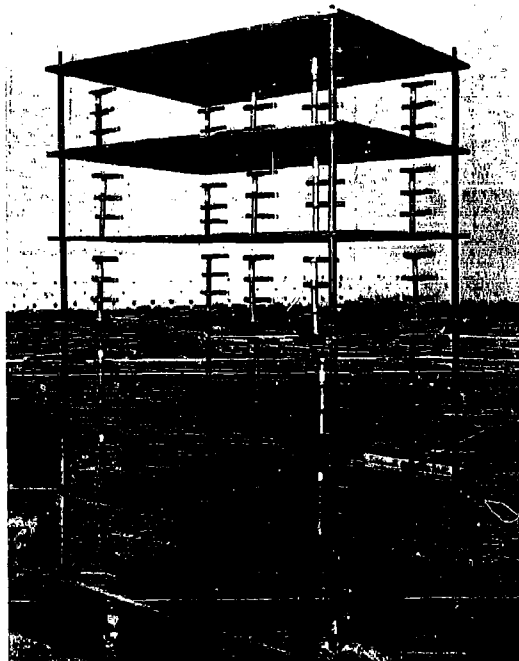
Model Structure: 0 psf Wall, 20 psf Floor
